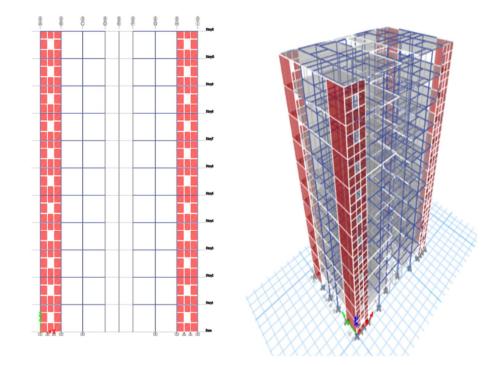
Two-dimensional and three-dimensional views of a multi-story construction with a perforated shear wall (pattern 1)
